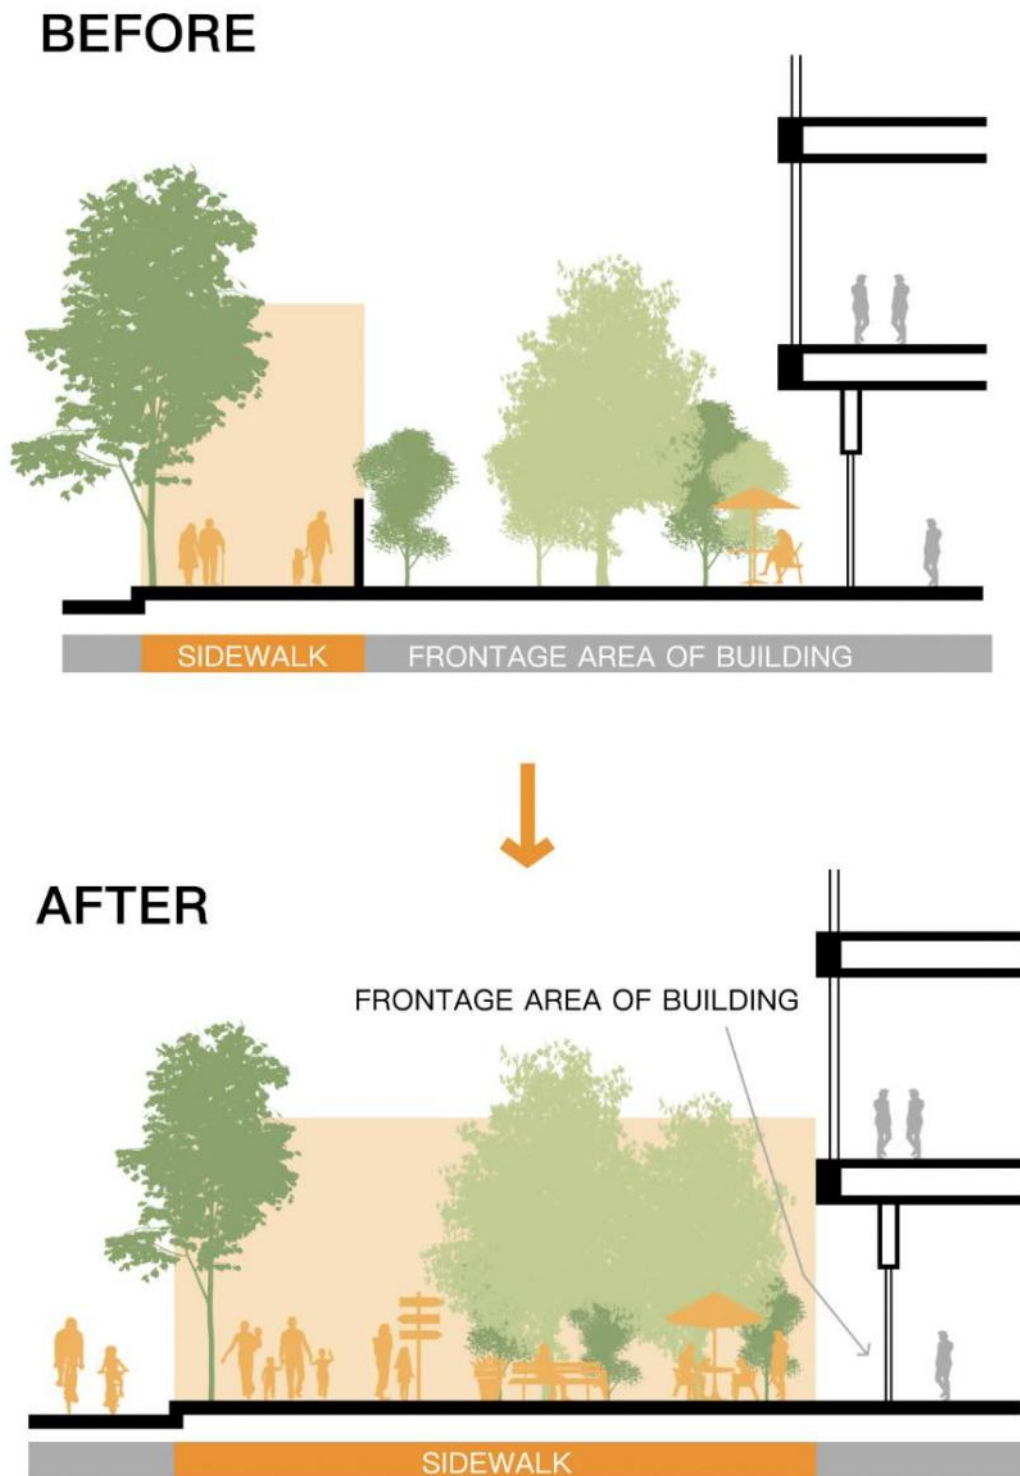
Incorporate adjacent spaces to widen the sidewalk space and add eyes on the street
